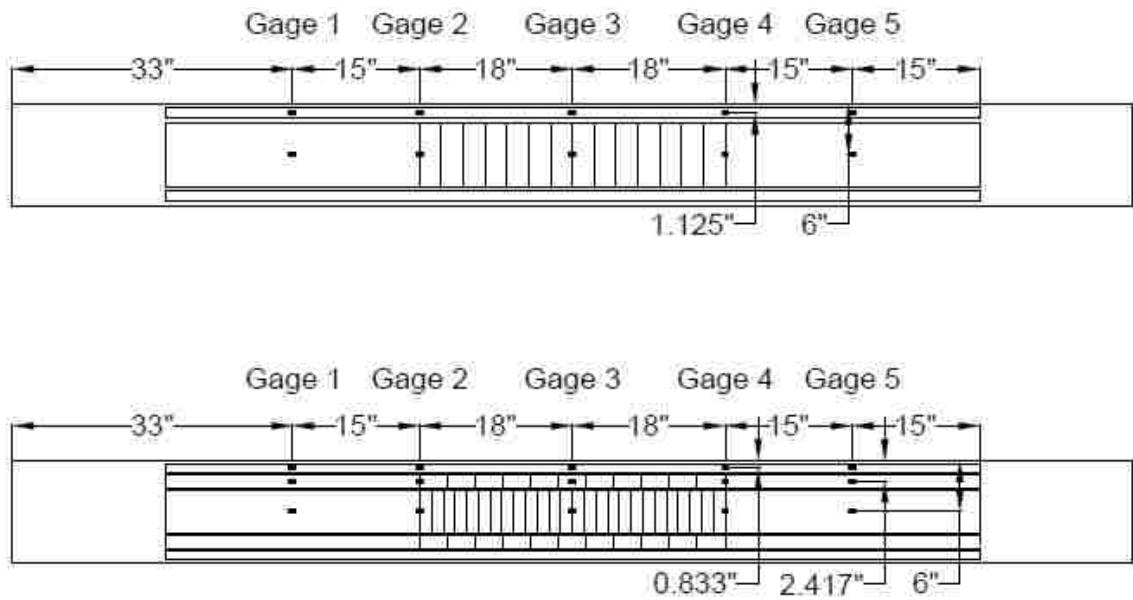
FRP Strain Gage Location: Beam 2 and Beam 3
